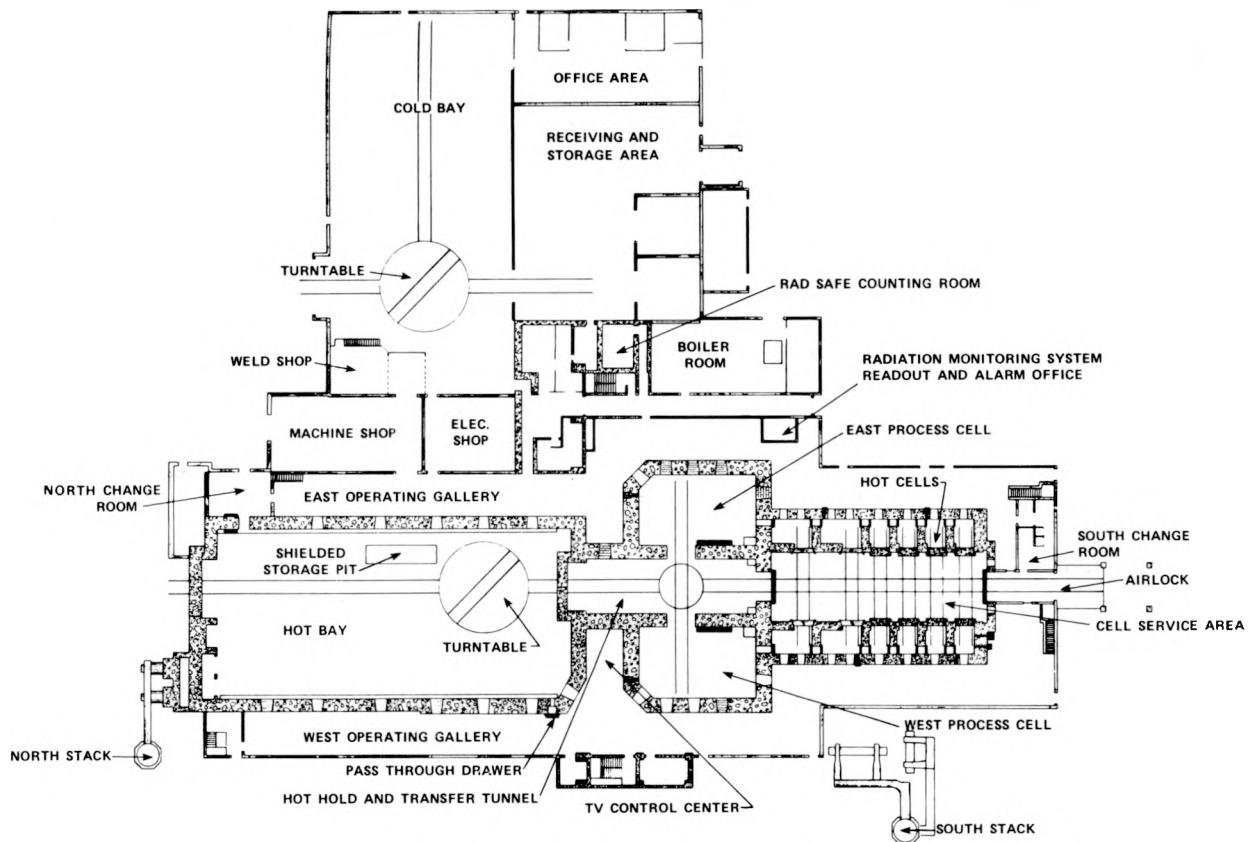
EMAD FACILITY MAIN FLOOR PLAN
